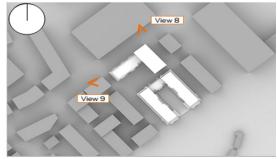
The layout of a proposed Scheme for Brent Cross South at London
